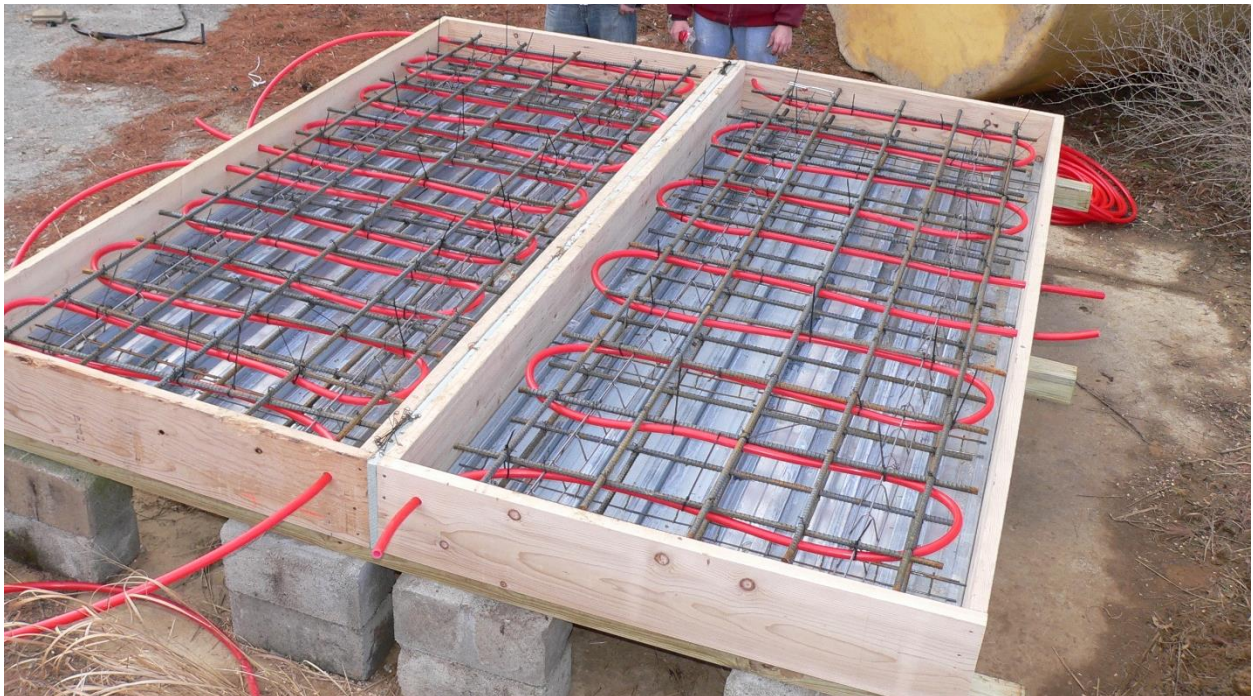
Addition of the two levels of rebar and circulation tubes to the formwork.
